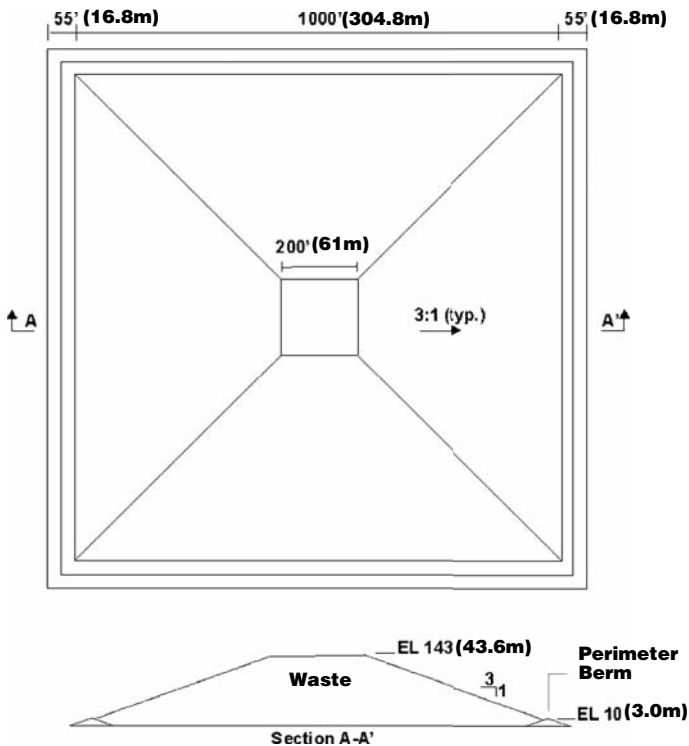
Plan view and cross section of a hypothetical landfill at capacity
